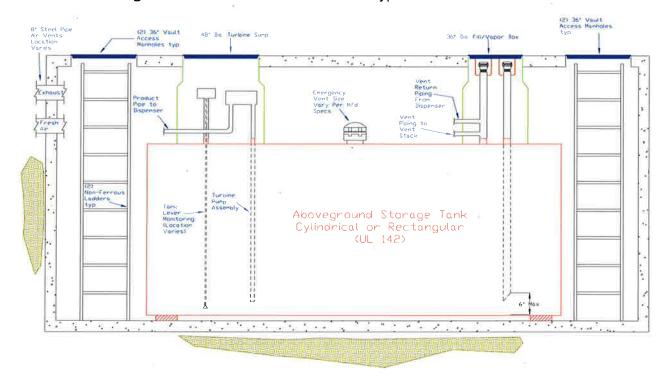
Front Sectional Views of Typical Vaulted AST
